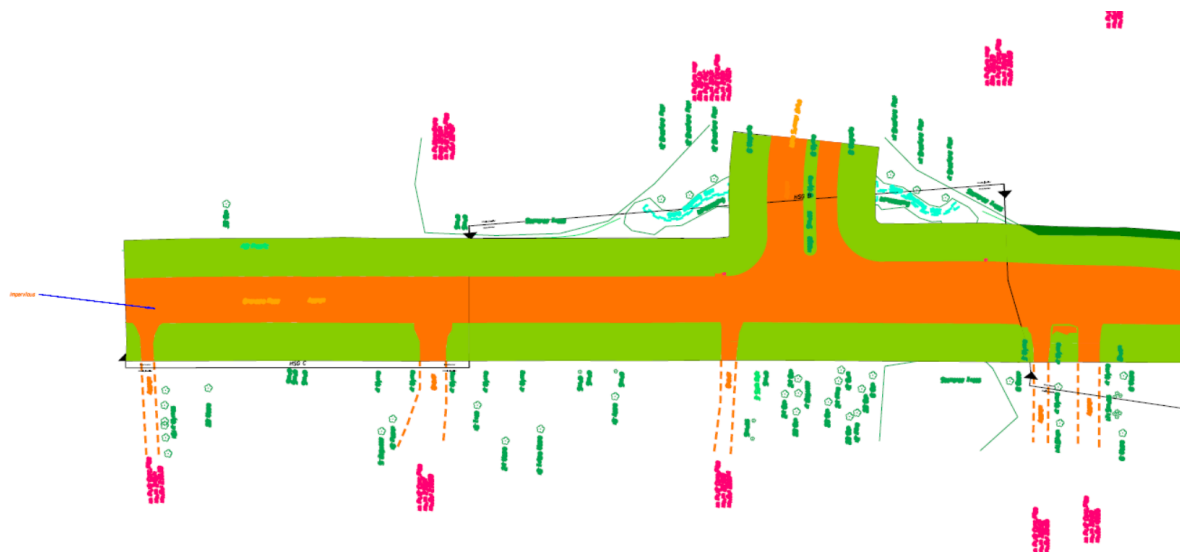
Revised Plan View of Existing Conditions Land Types Close Left Side View
